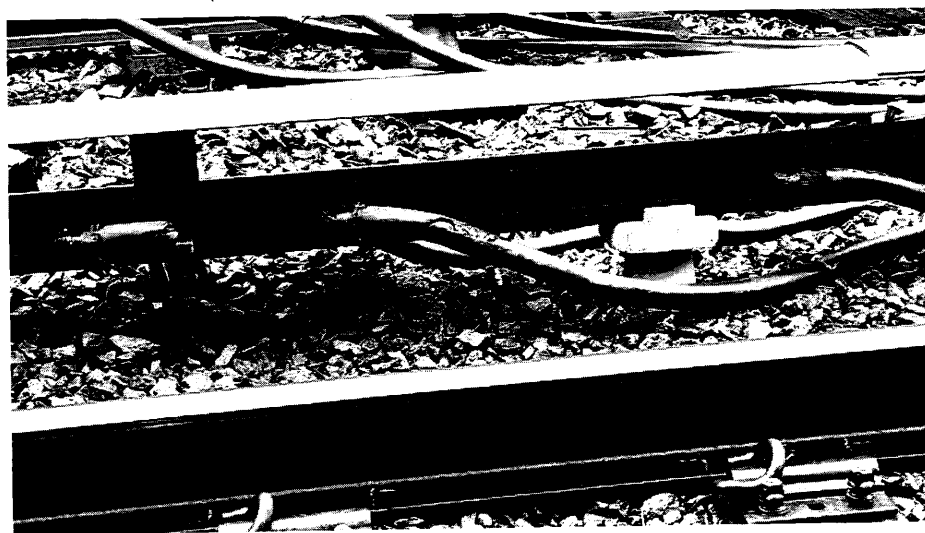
C2 CM 507+00 Expansion Joint Cables with slashed insulation - Cables are lying on the ground with some tie plates on them
